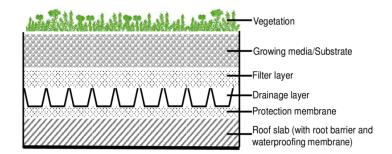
Green roof schematic by C. Pimentel-Rodrigues, A. Silva-Alfonso and M. Lima .
